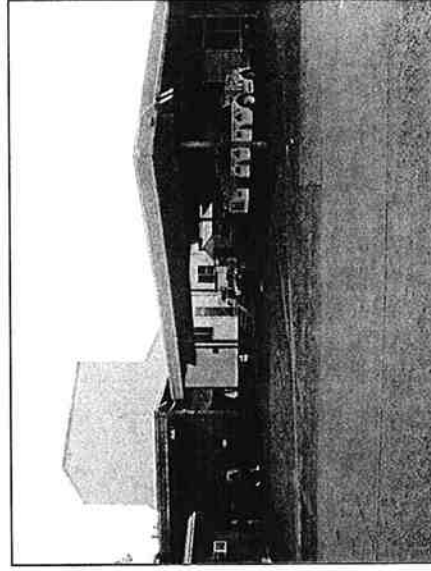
Photo of existing Hawaiian Airlines baggage facilities within Improvement Area 7; view to the east
